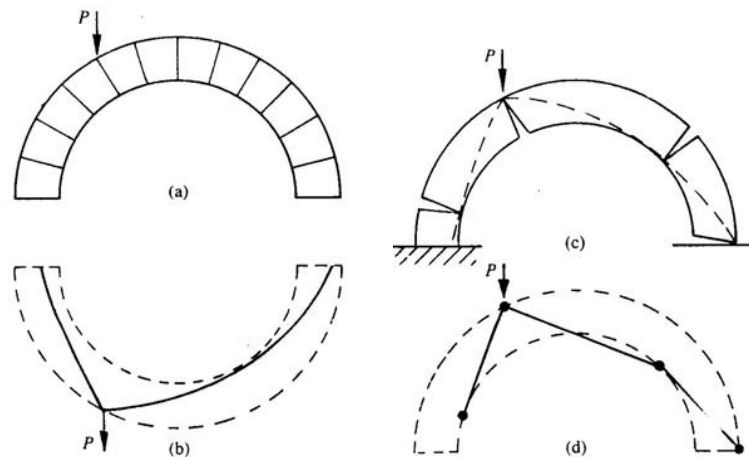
Collapse of a semi-circular masonry arch under a point load [11].
